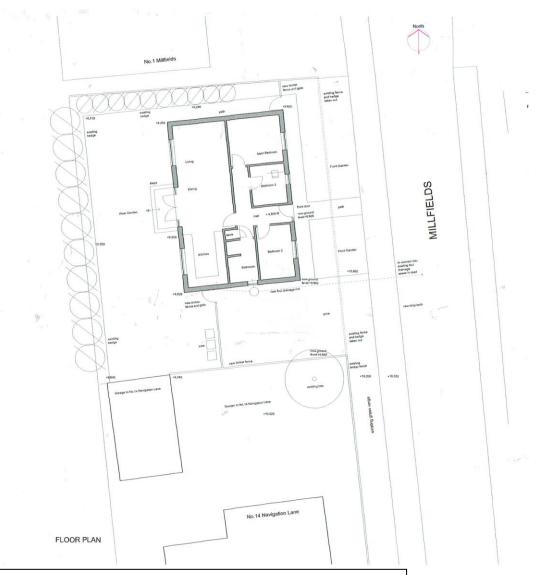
Block plan showing the proposed layout of the development site at a scale of 1:200 at A2, (extract from Architects plan)
